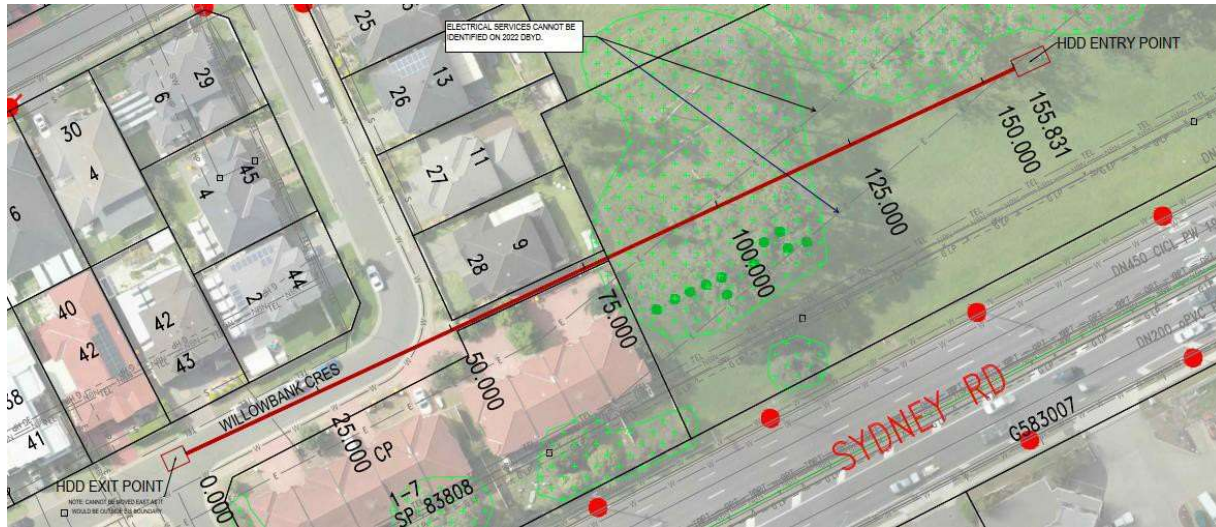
Willowbank Crescent Crossing parking space removal area
